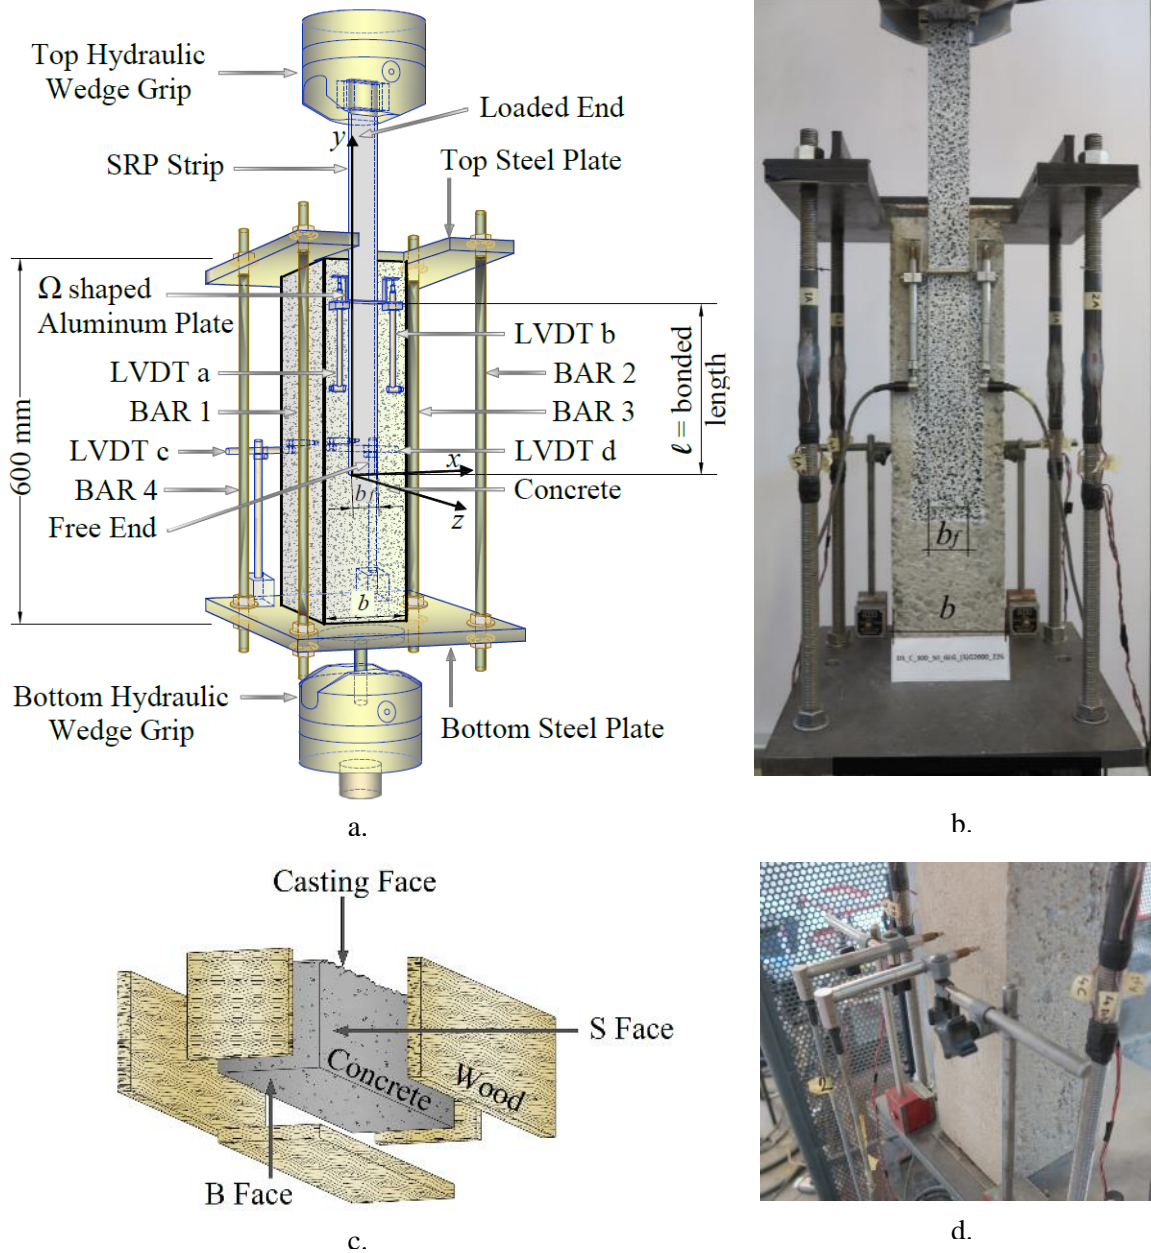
a) Single-lap shear test set-up; b) Photo of specimen DS_300_50_HD_D_B_2; c) Sketch of the casting procedure and definition of the faces of the prism; d) Photo of LVDT c and d.
